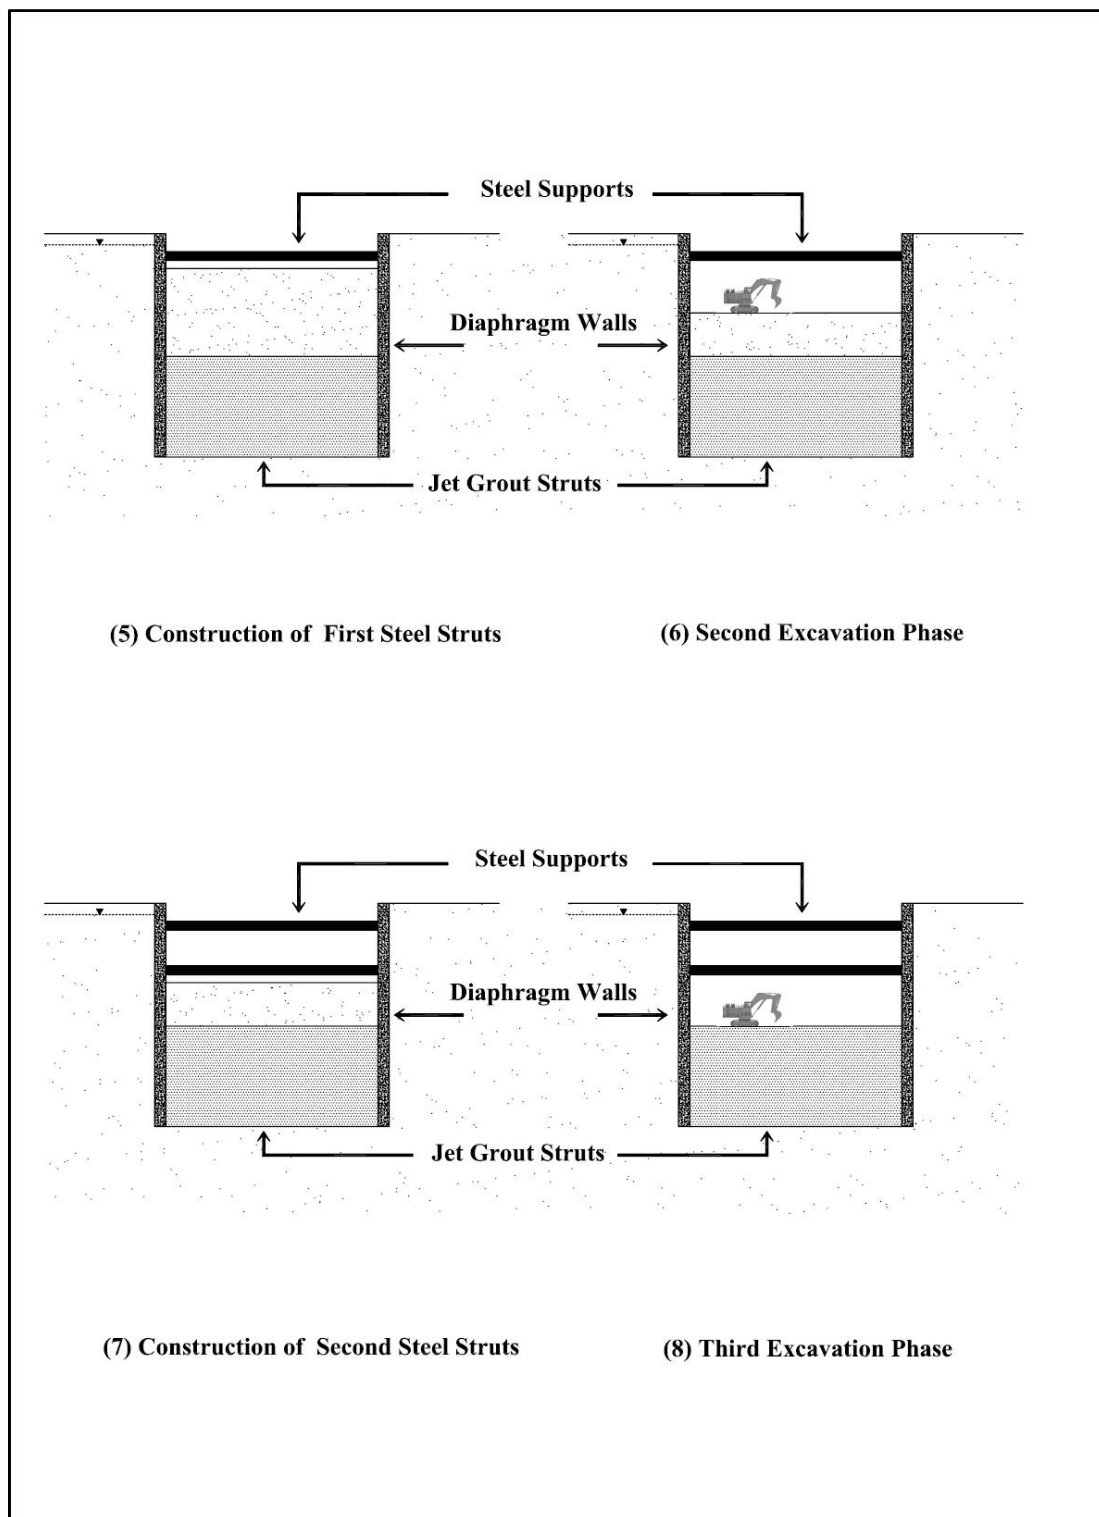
6 Construction stages of V, VI, VII and VIII.
